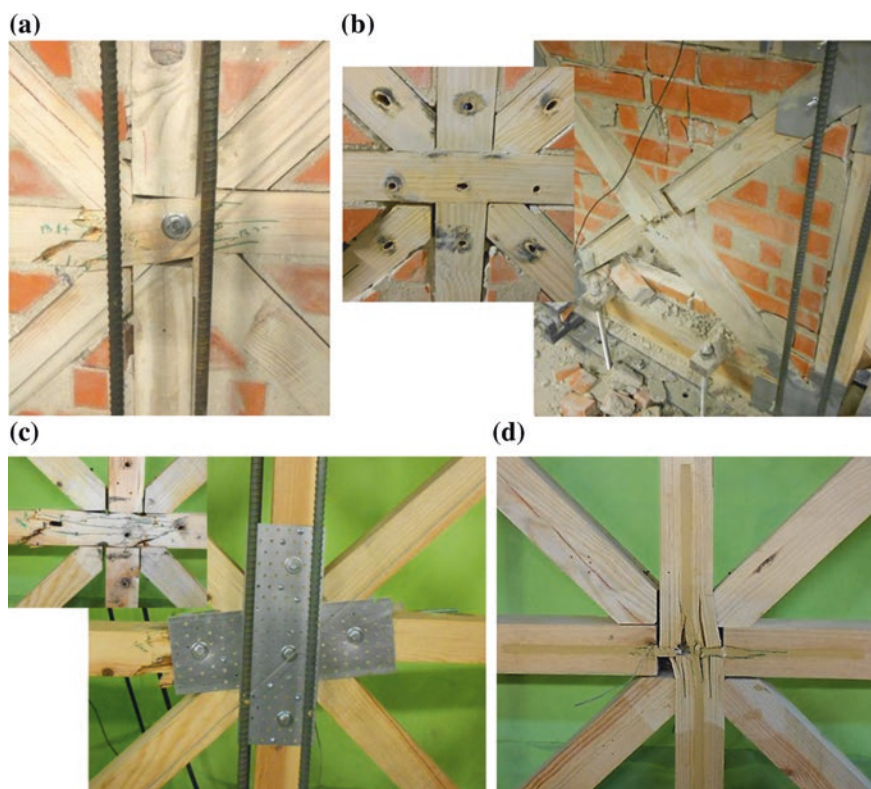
Typical damages in walls: a tearing of timber element in infill wall retrofitted with bolts; b failure of half-lap joint of diagonals in infill wall retrofitted with steel plates; c failure of central connection in timber frame wall retrofitted with steel plates; d failure of steel bar at central connection in timber frame wall
